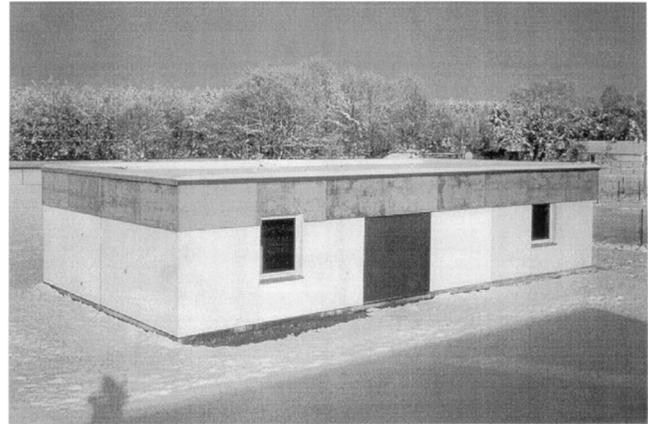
West facade with EIFS (left) and monolithic brick wall sections with red and white stucco facing south of the test house.
